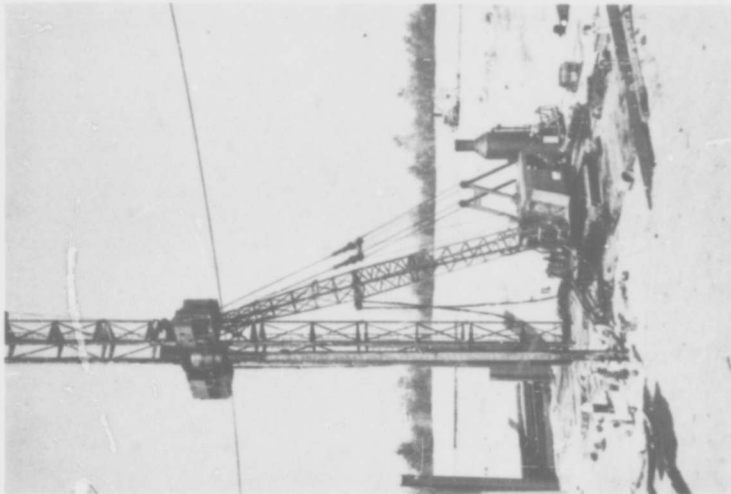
Driving Pipe Pile with Bodine Sonic Hammer, Test Pile 10 - 16-In. Steel Pipe Pile
